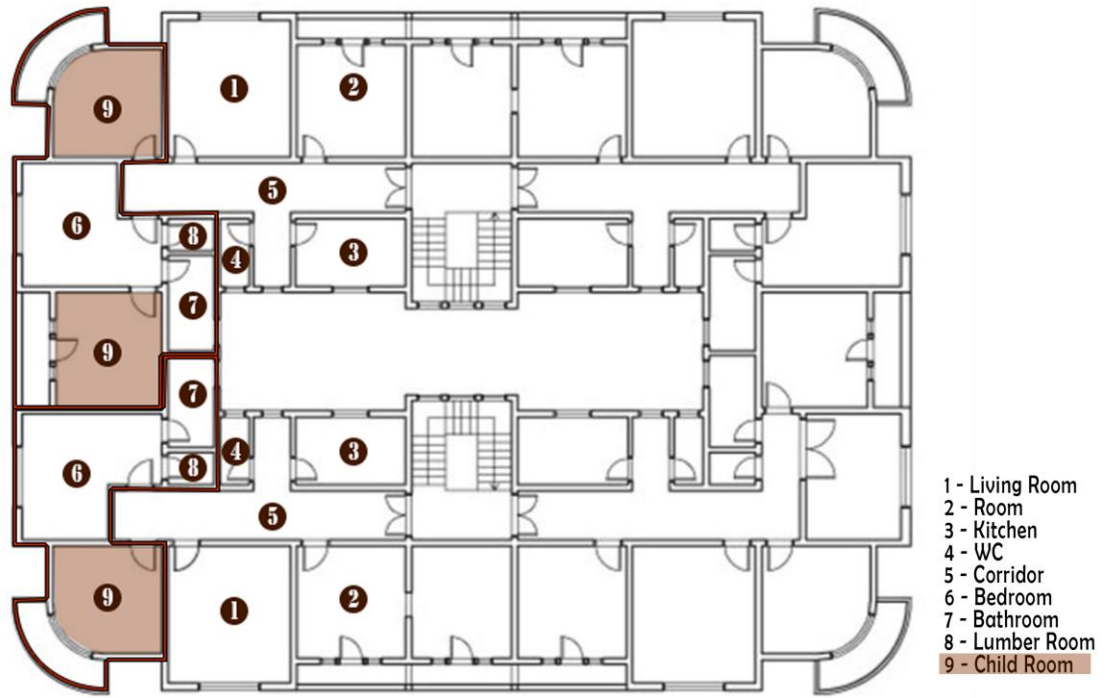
The regular floor plan of Children's Protection Agency Rental Apartment, Ankara (Source: Avcı Hosanlı, 2021)
